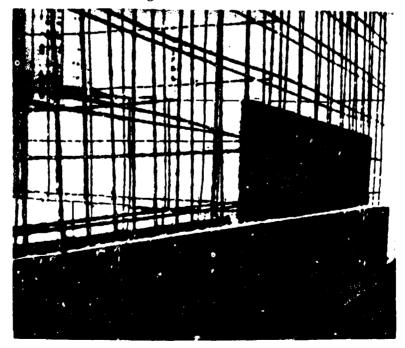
Wood-wool cement boards used in shell-concrete construction - initial stages
